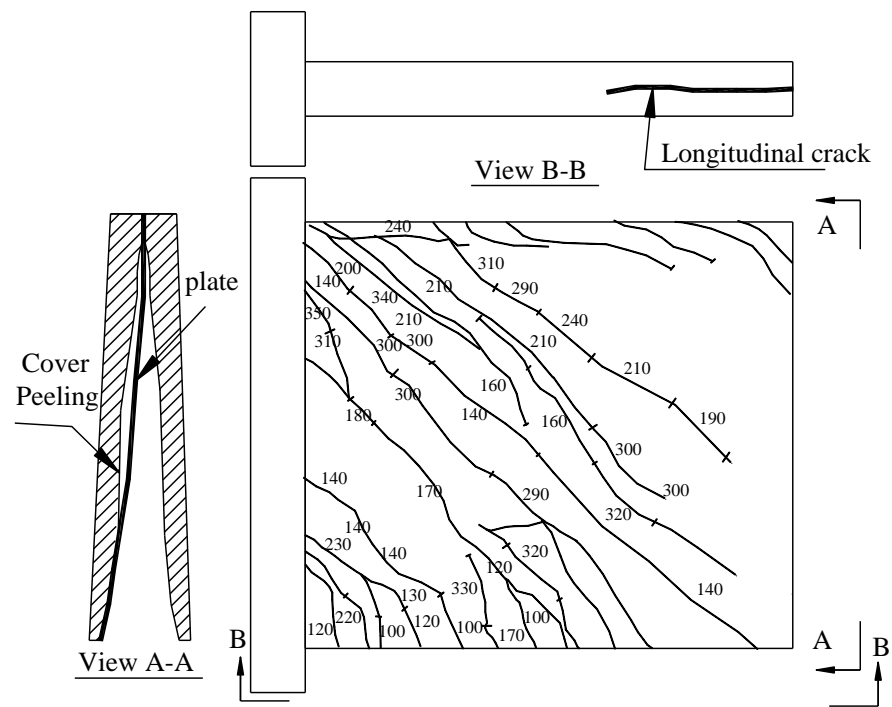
Specimen EW23: Crack pattern for specimen at failure
